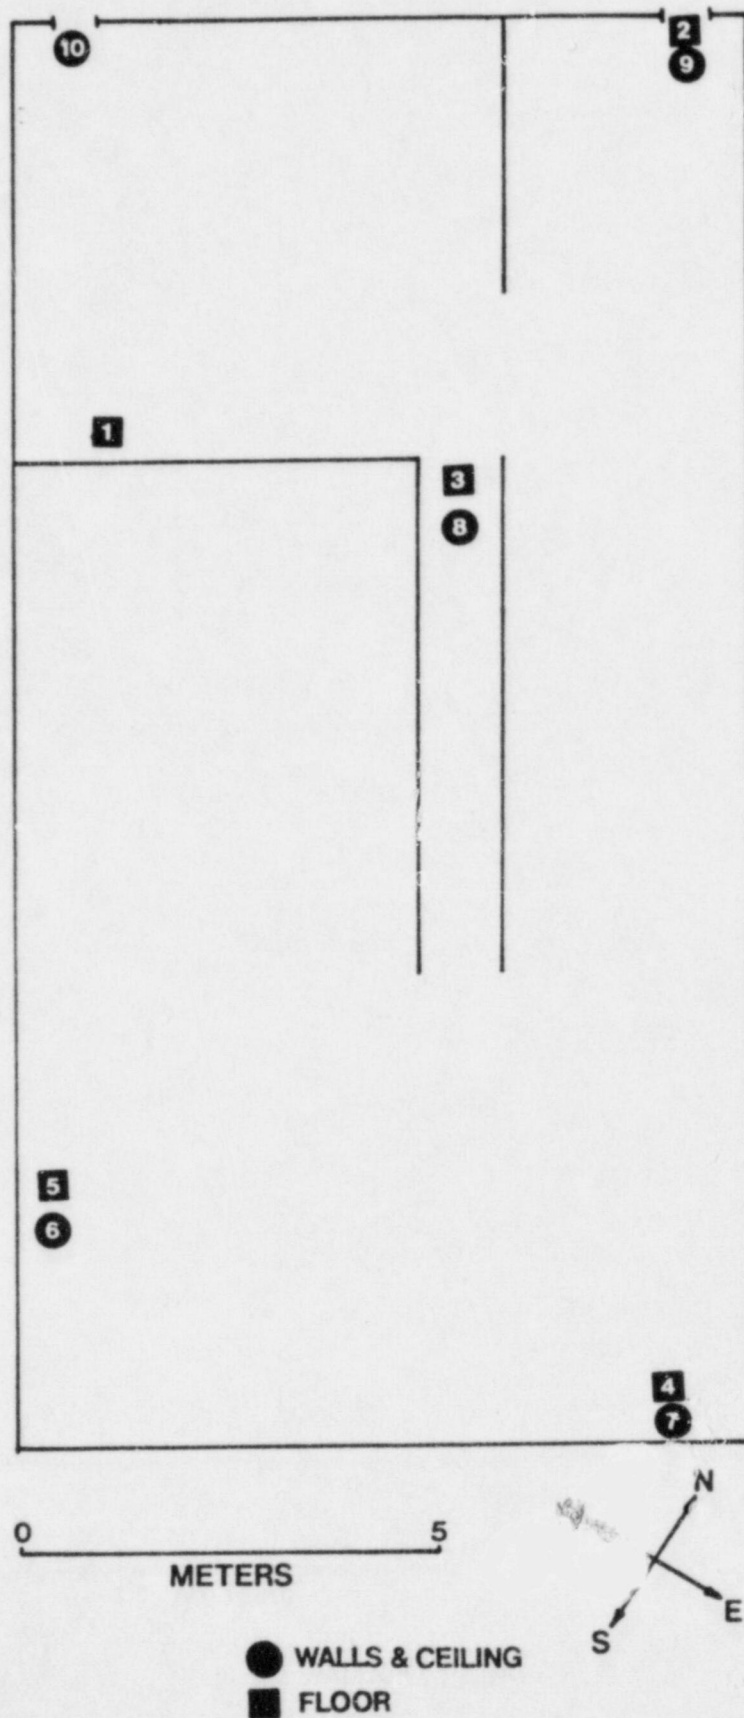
Floor Plan of the Locker Room Indicating Locations of Measurements and Smears
